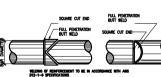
TYPICAL SECTION OF BEAM FIG. 7. TYPICAL WELD SPLICE DETAIL
